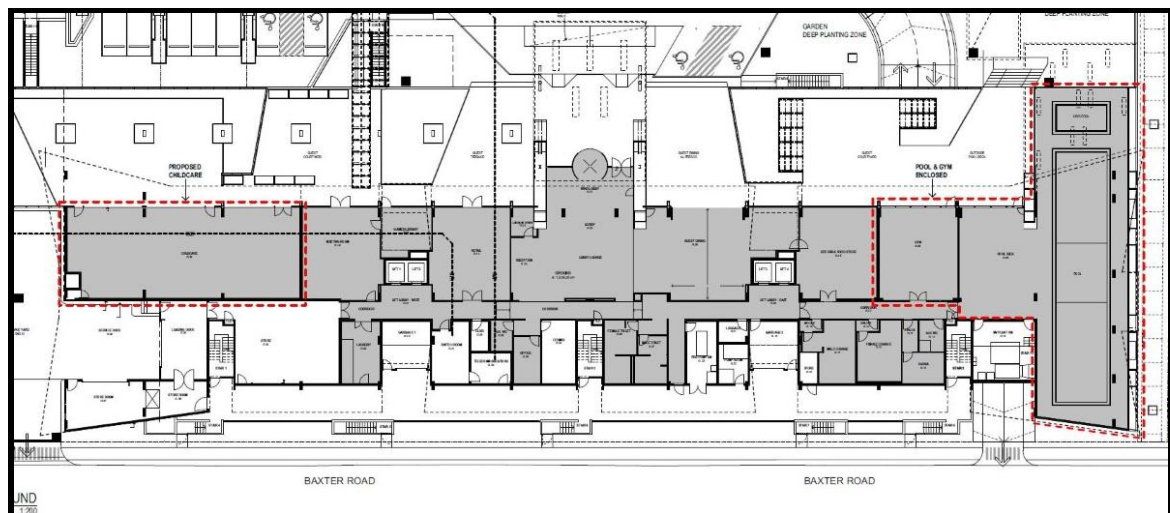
Proposed Ground Floor Plan - enclosure of the western and western ends
